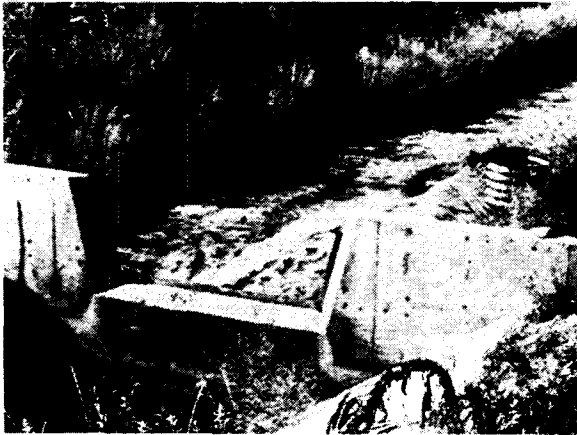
Concrete weir structure with standard contracted Cipolletti weir. PX-D-72611
